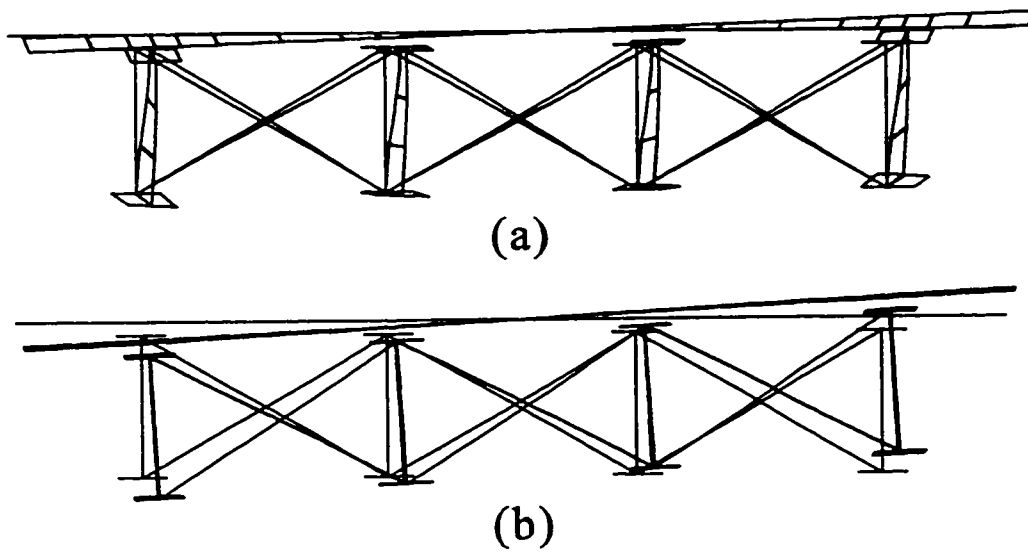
End views of deformed shapes for the 40 m span bridge at: (a) one end; and (b) a distance of 8 m from bridge end.
